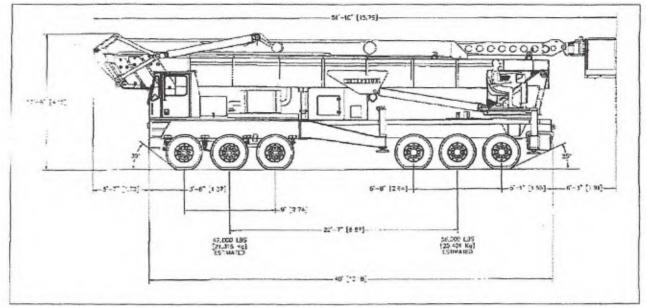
Example Aerial Lift Crane to be Used During Construction (Roadable Length 52 Feet; Width 8 Feet 6 Inches)
